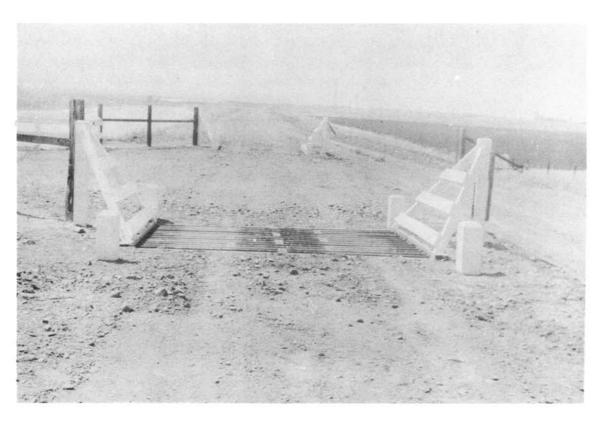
Redwood posts have been installed to protect the wing guards on standard cattle guards on the Delta-Mendota Canal to prevent type of damage shown in photograph 7, above.
